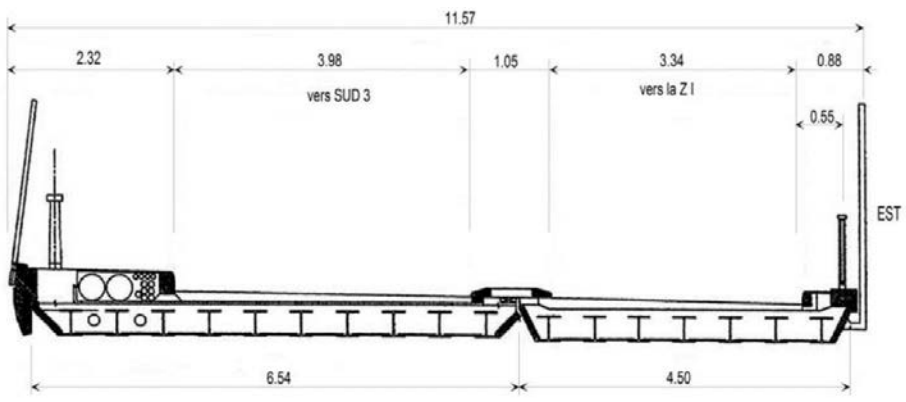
Deck Cross section of the existing bridge (Matteis et al., 2008)
